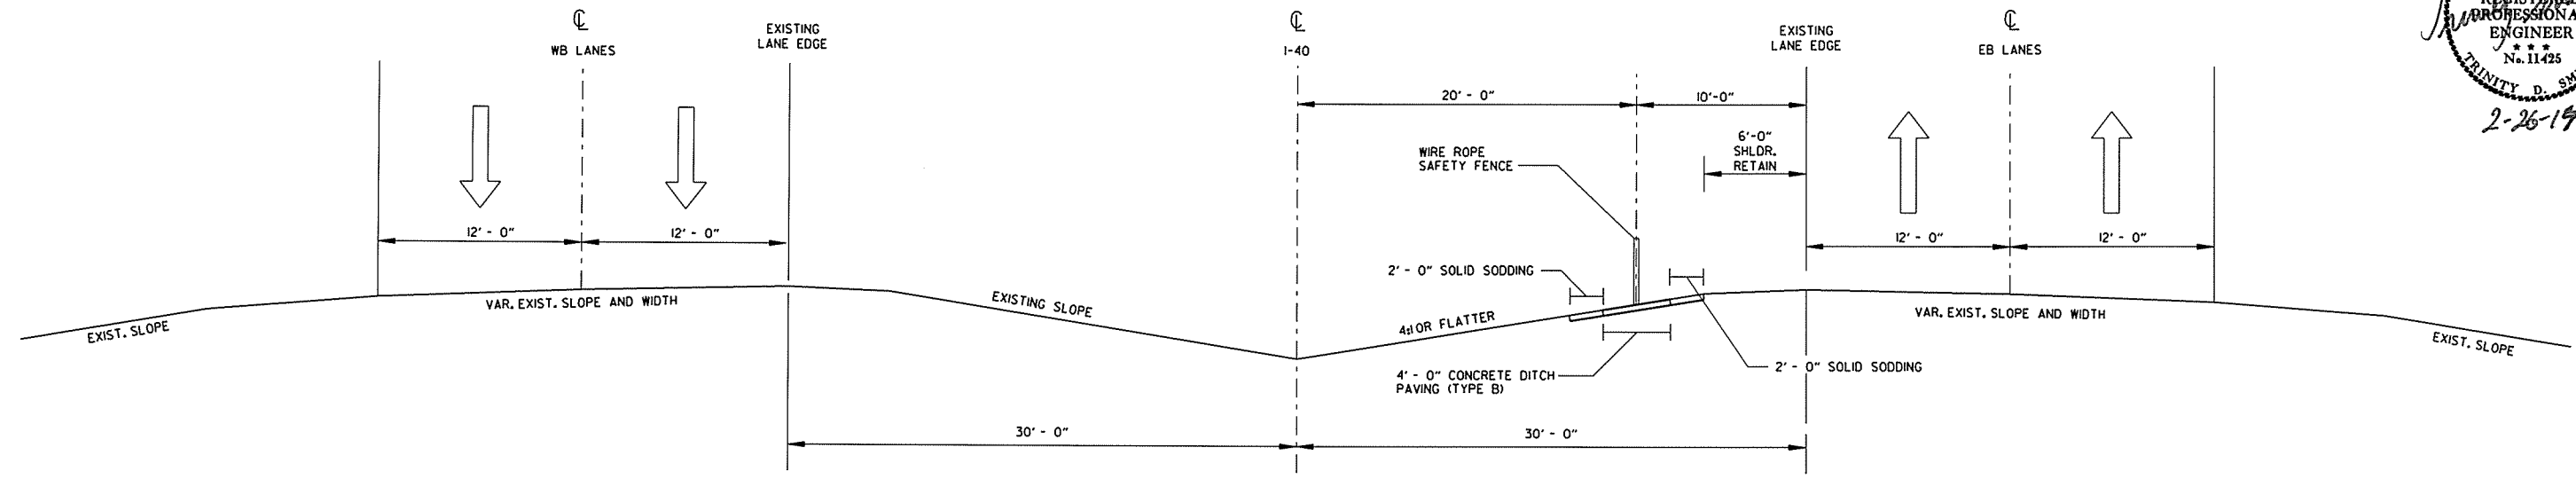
### DETAIL OF WIRE ROPE SAFETY FENCE AT EXISTING BRIDGE ENDS
